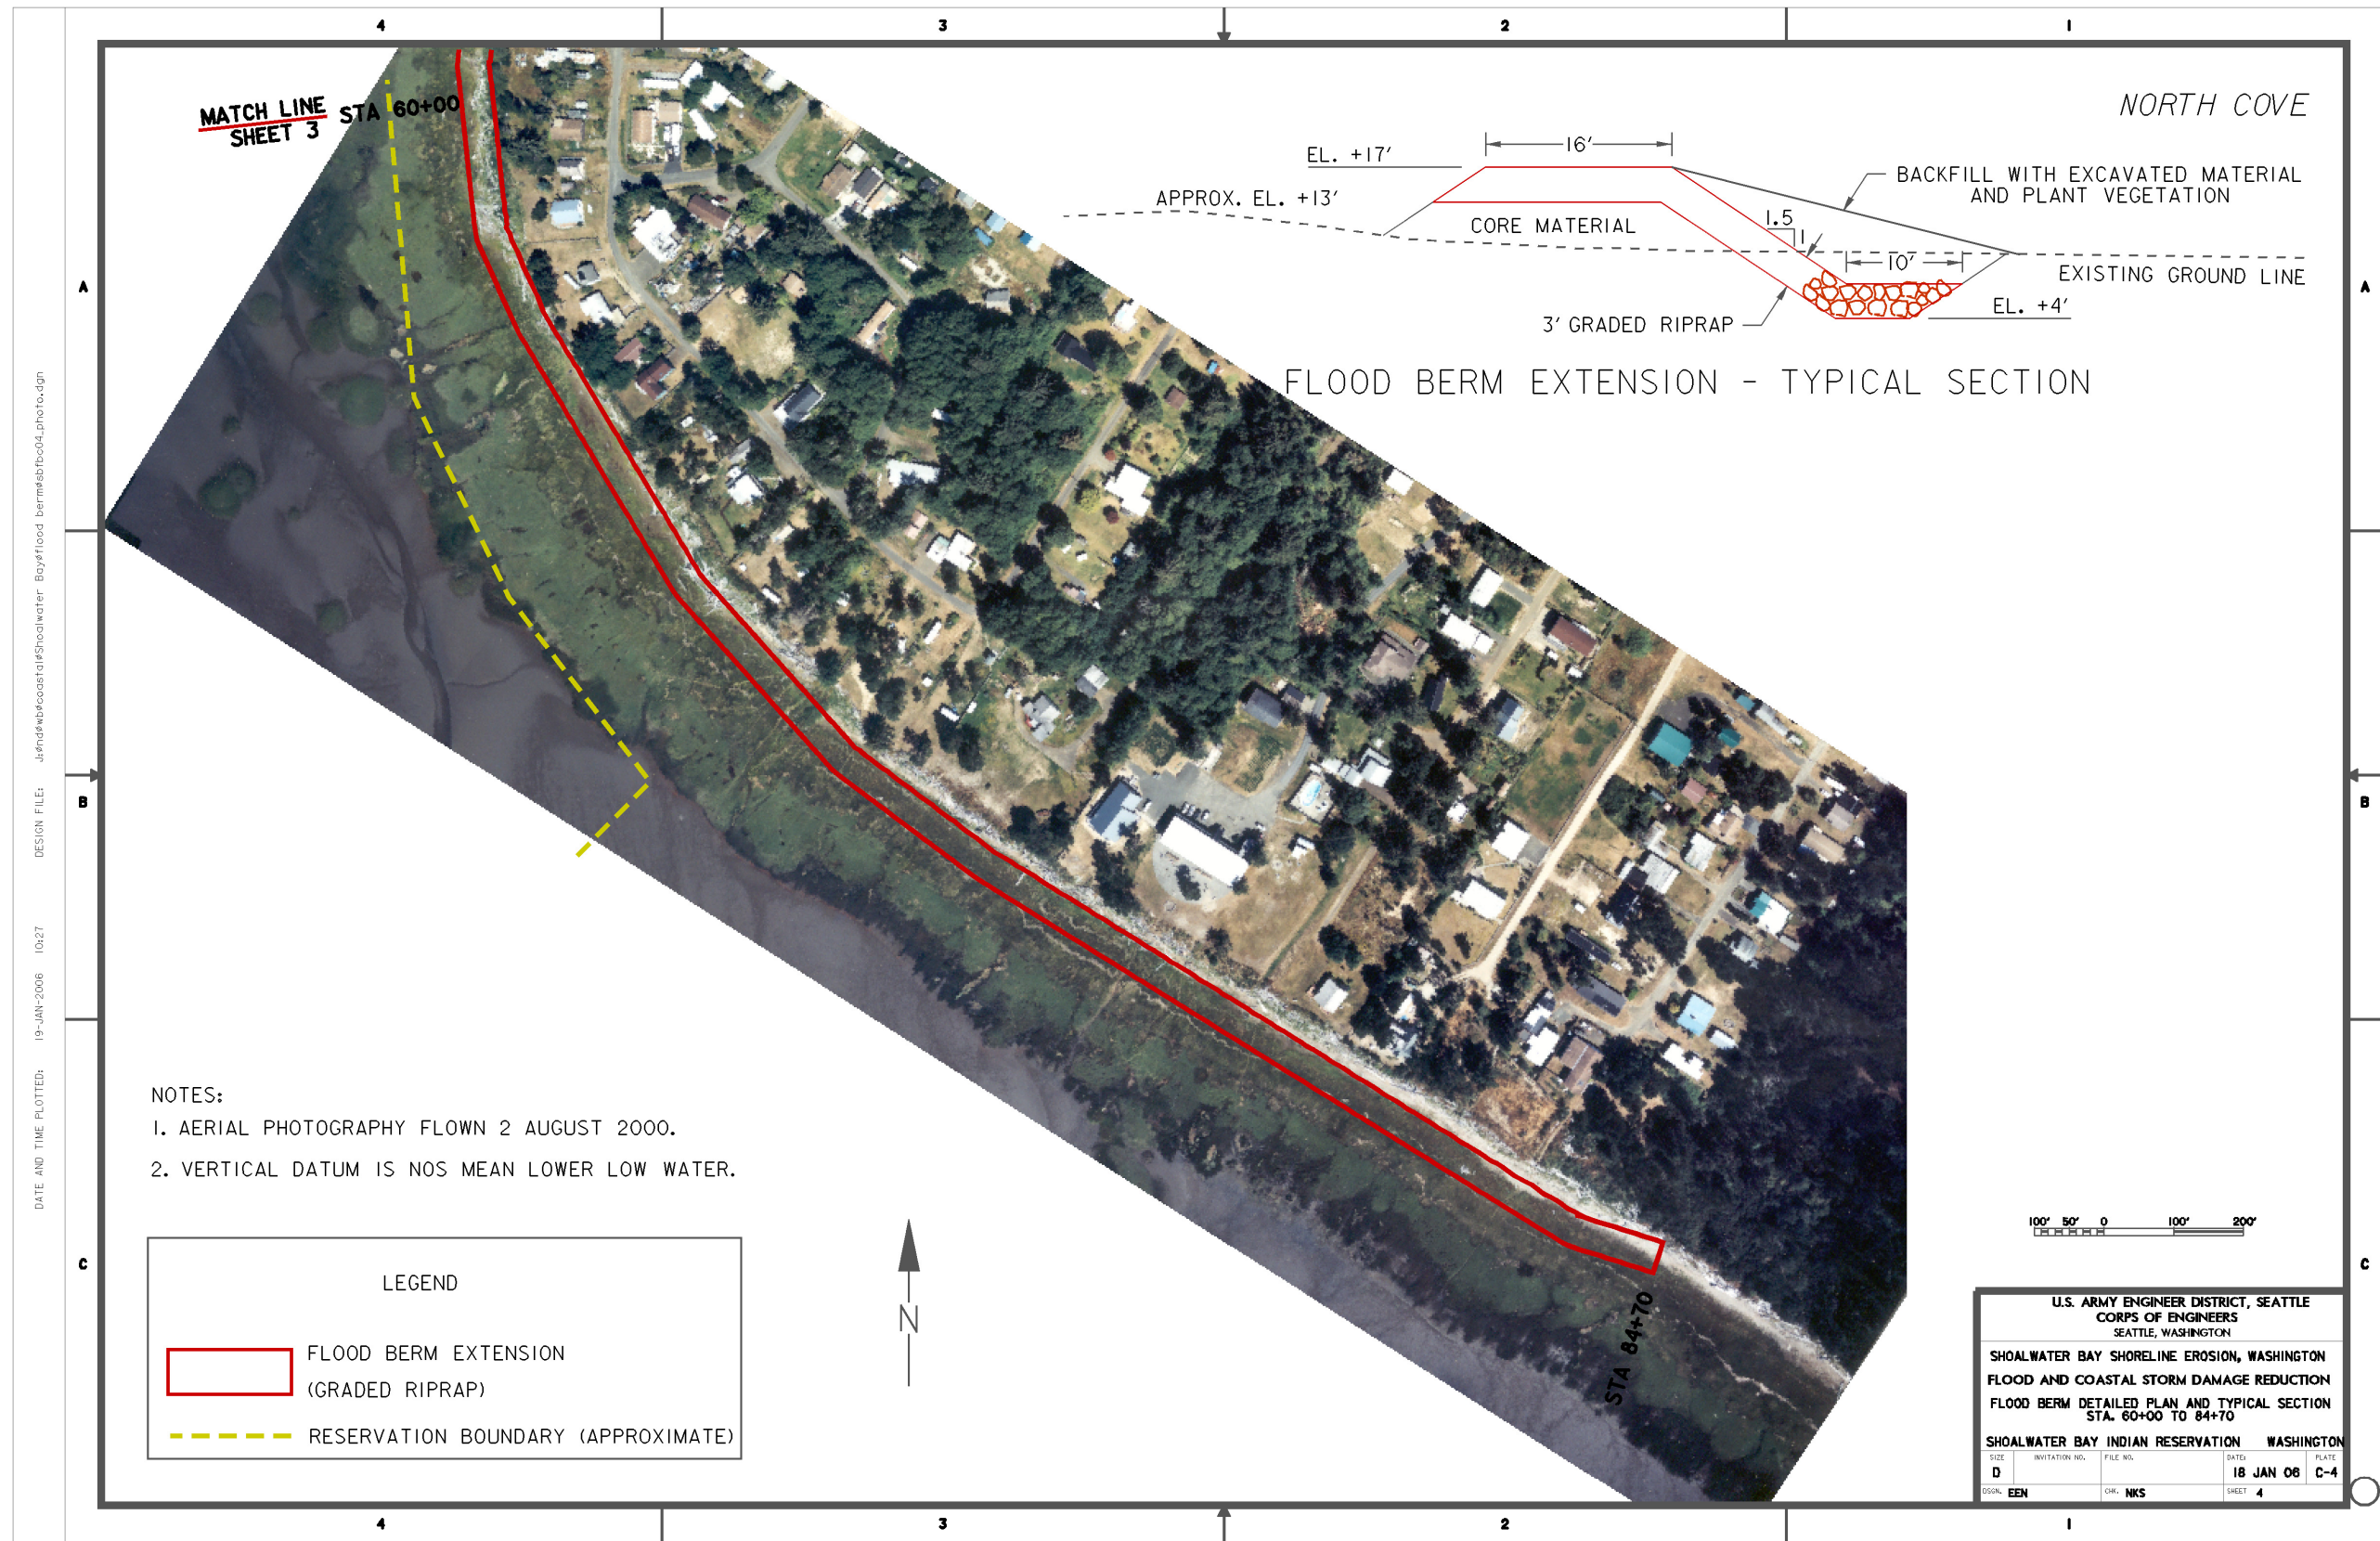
Flood berm detailed plan and typical section, station 60+00 to 84+70.
